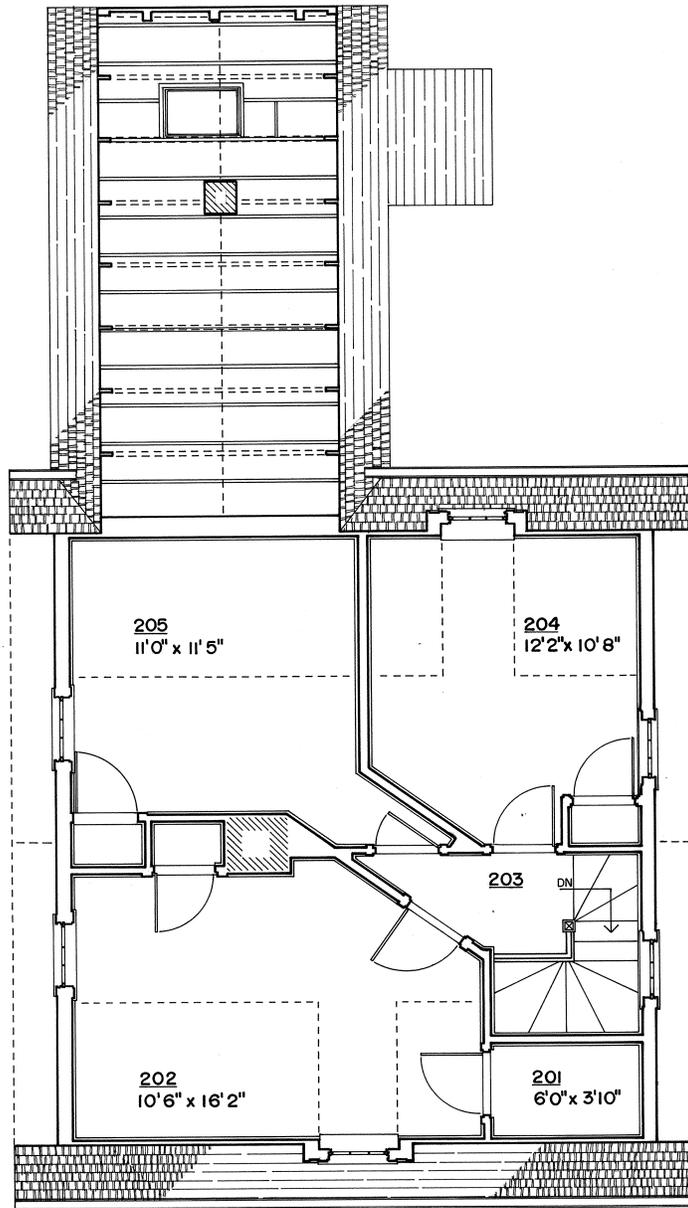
Second-floor plan of the keeper's dwelling, Baker Island Light Station. Drawing by the Historic American Buildings Survey, 1976.
